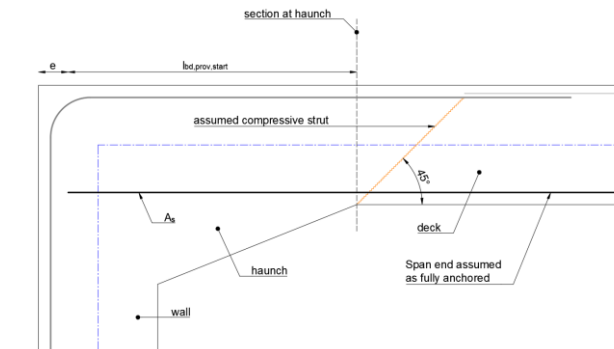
Schematics of determining the provided anchorage length of the bottom reinforcement in the section at the haunch
